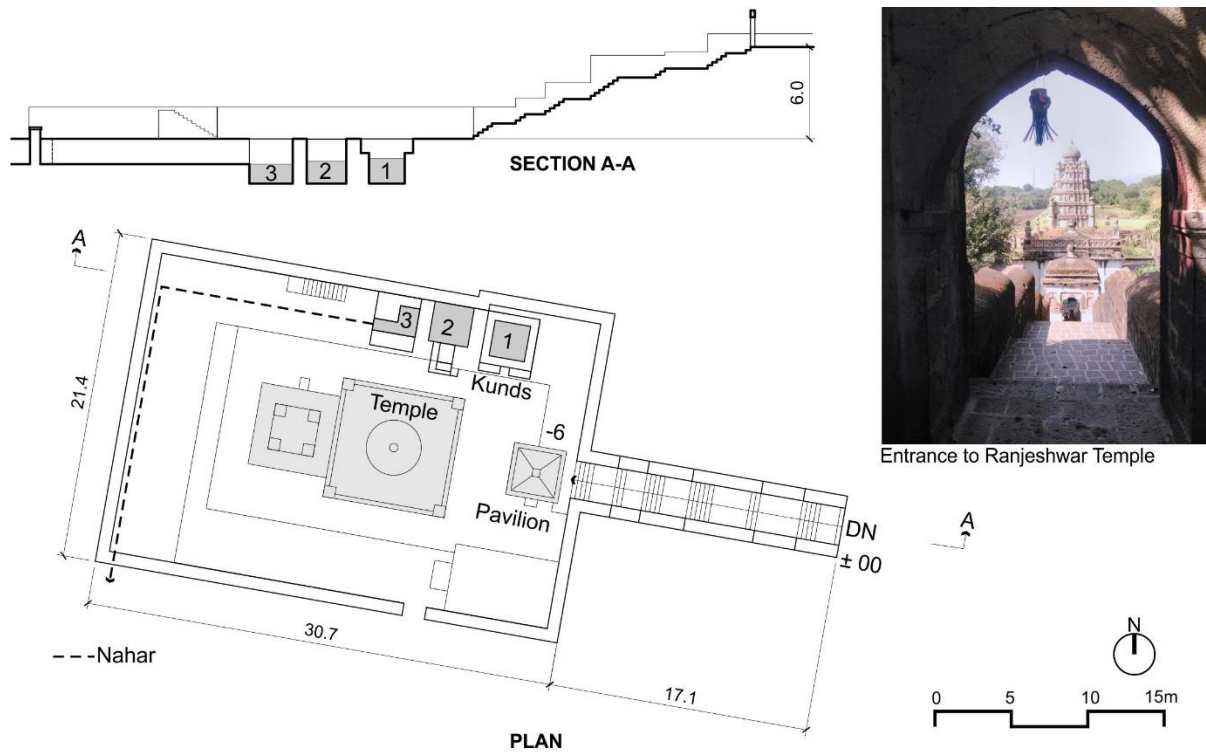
Plan, section and photograph of Ranjeshwar temple.
